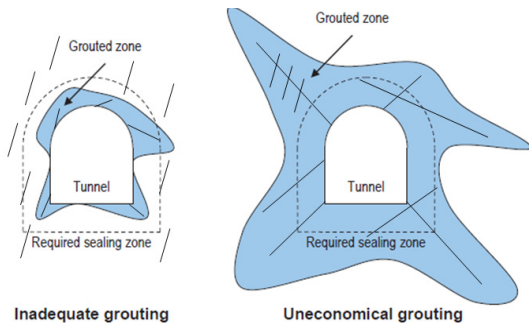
Grout penetration around excavated tunnel in jointed rock mass (after Kobayashi and Stille, 2007)
